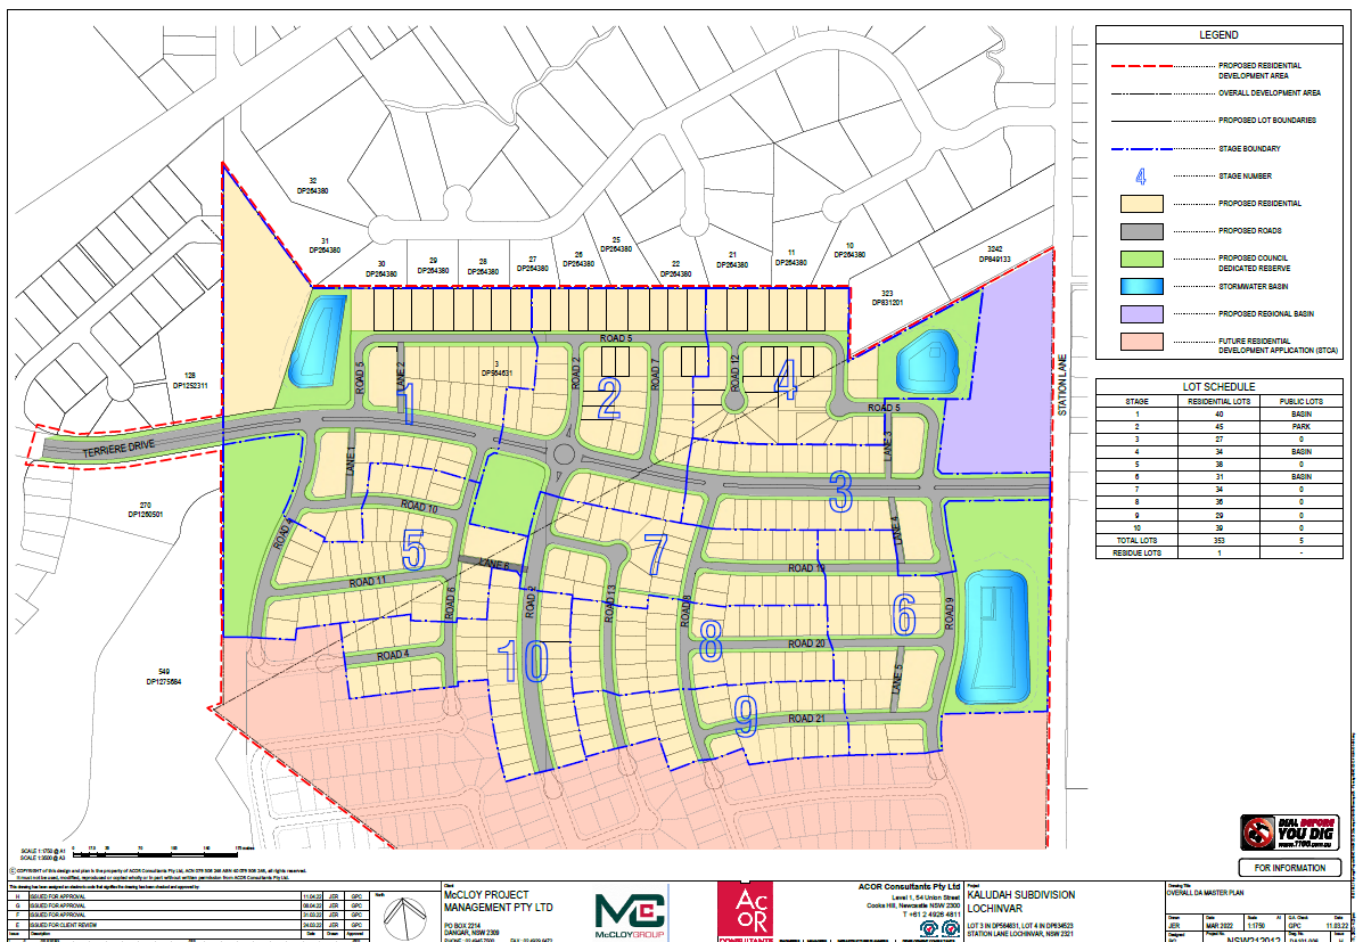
Plan of Proposed Subdivision - Stages 1 to 10
